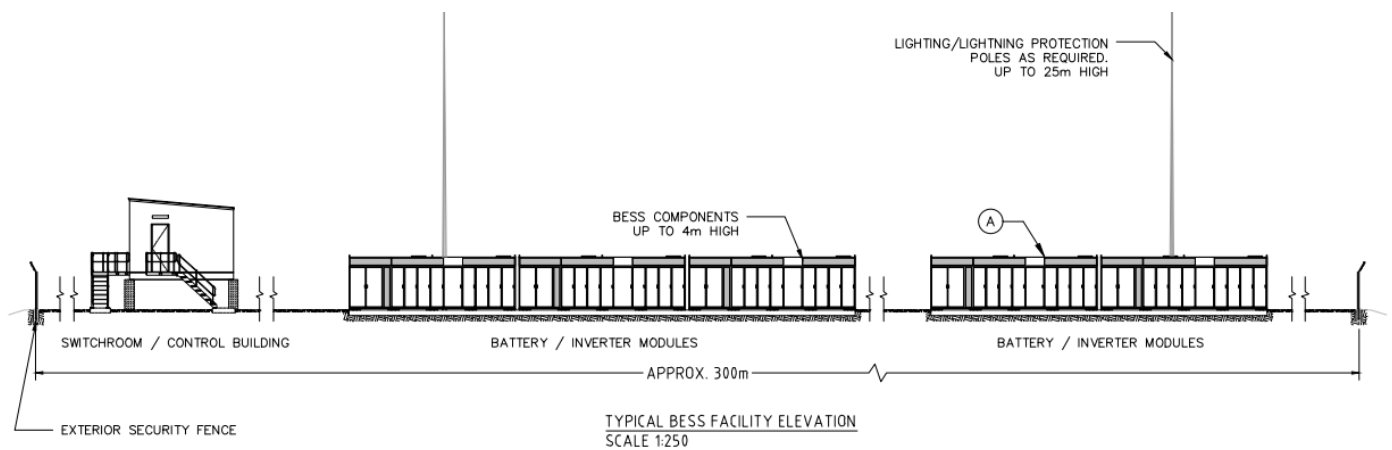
Elevation of proposed BESS facility (Advertised Development Plans)
